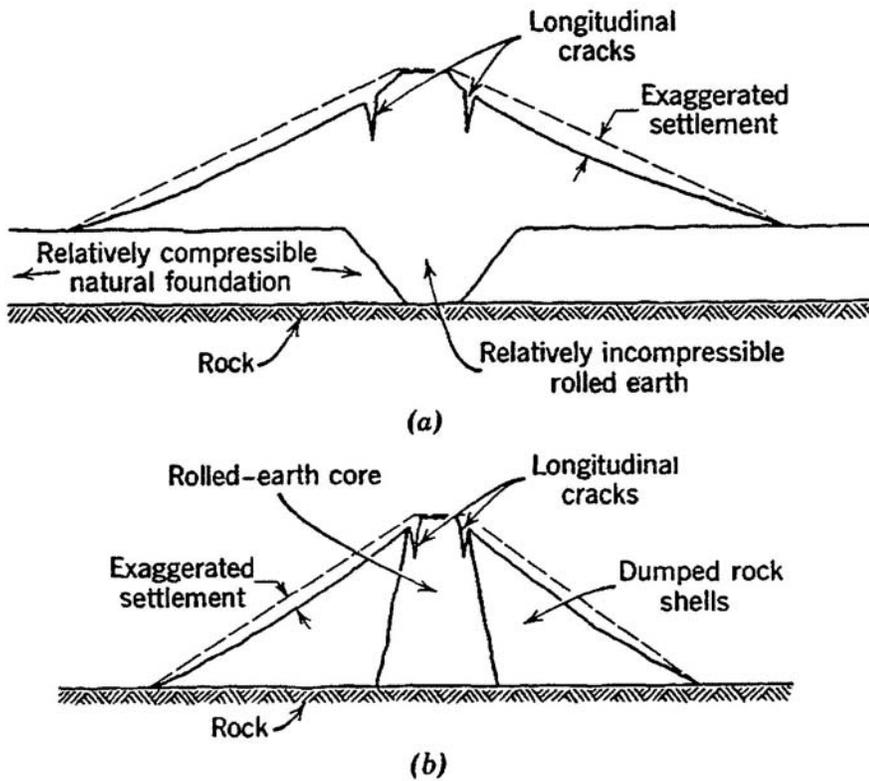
B. – Longitudinal cracks. (a) Cracking caused by differential foundation settlement. (b) Cracking caused by differential settlement between embankment sections of dumped rock and rolled earth.
